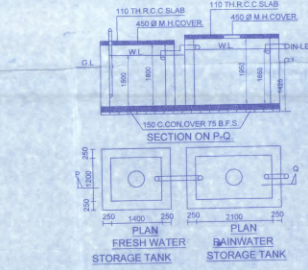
DETAIL OF S.U.G. WATER RESERVOIR SCALE = 1:50
